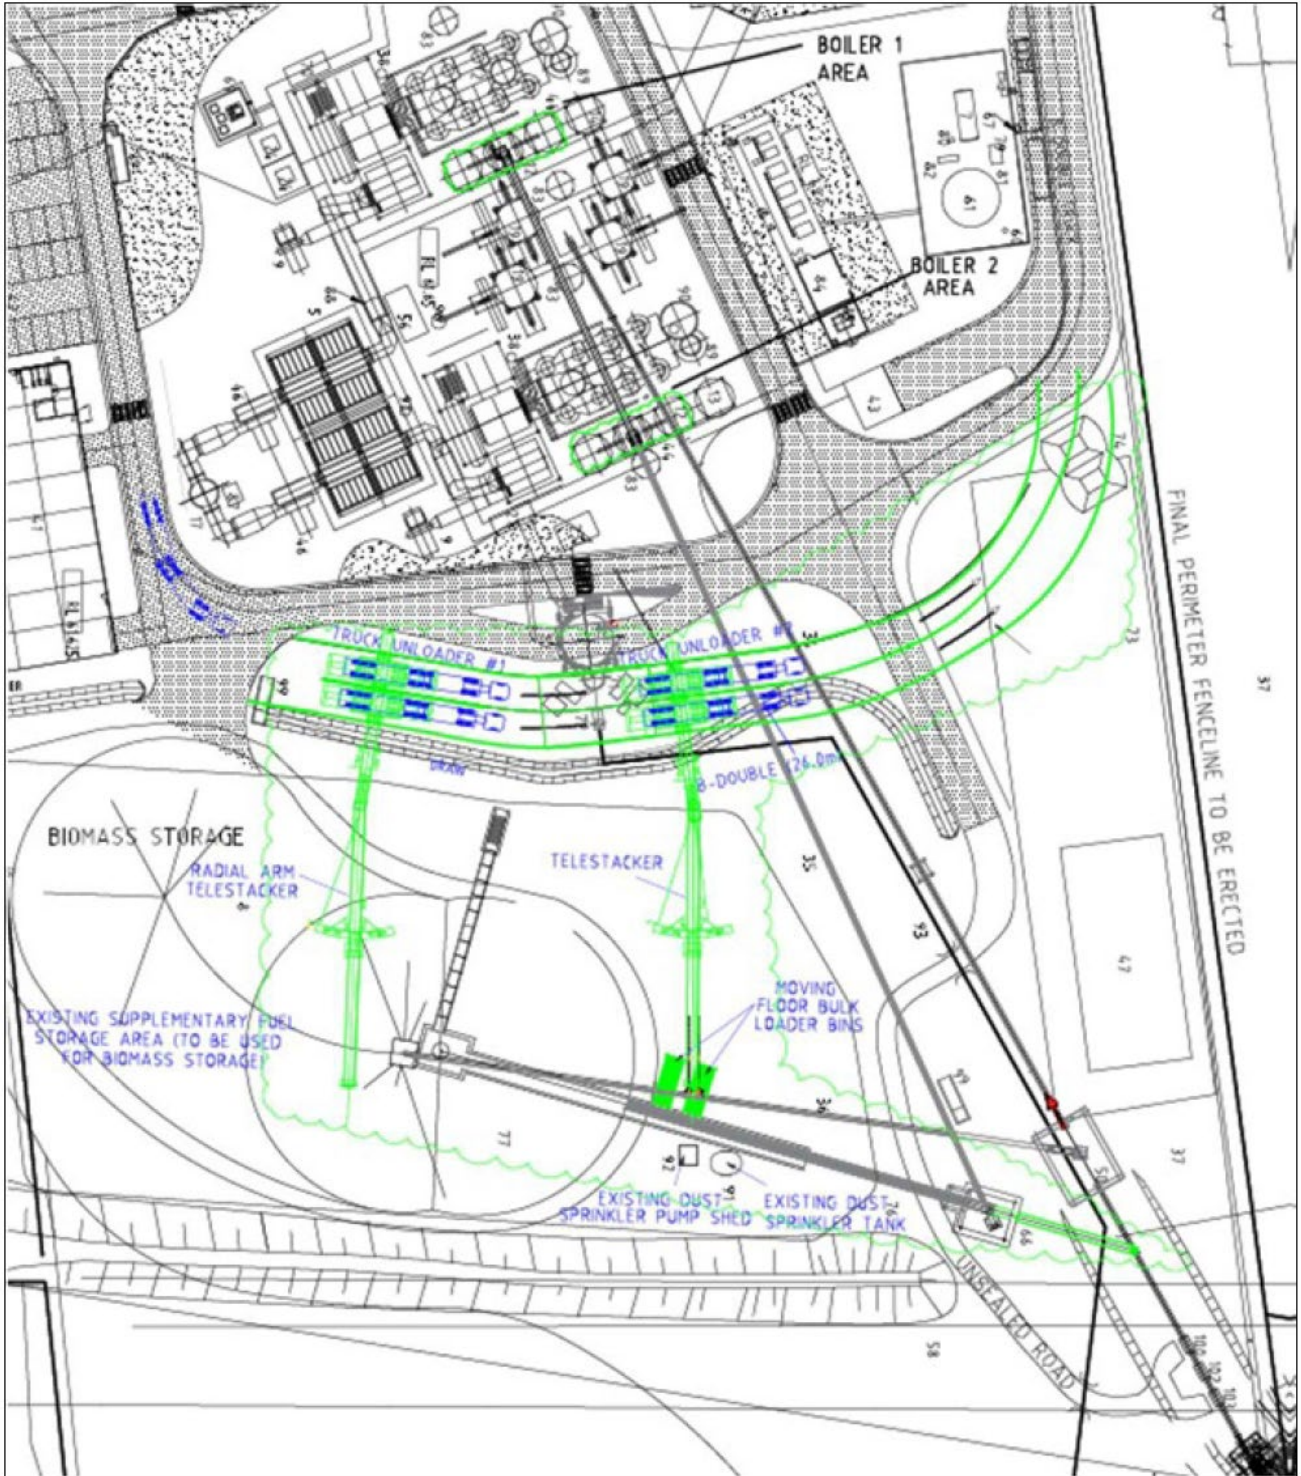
Biomass receival and handling showing additional plant/equipment in green. East elevation view. Refer to Appendix 3 for high resolution plan.
